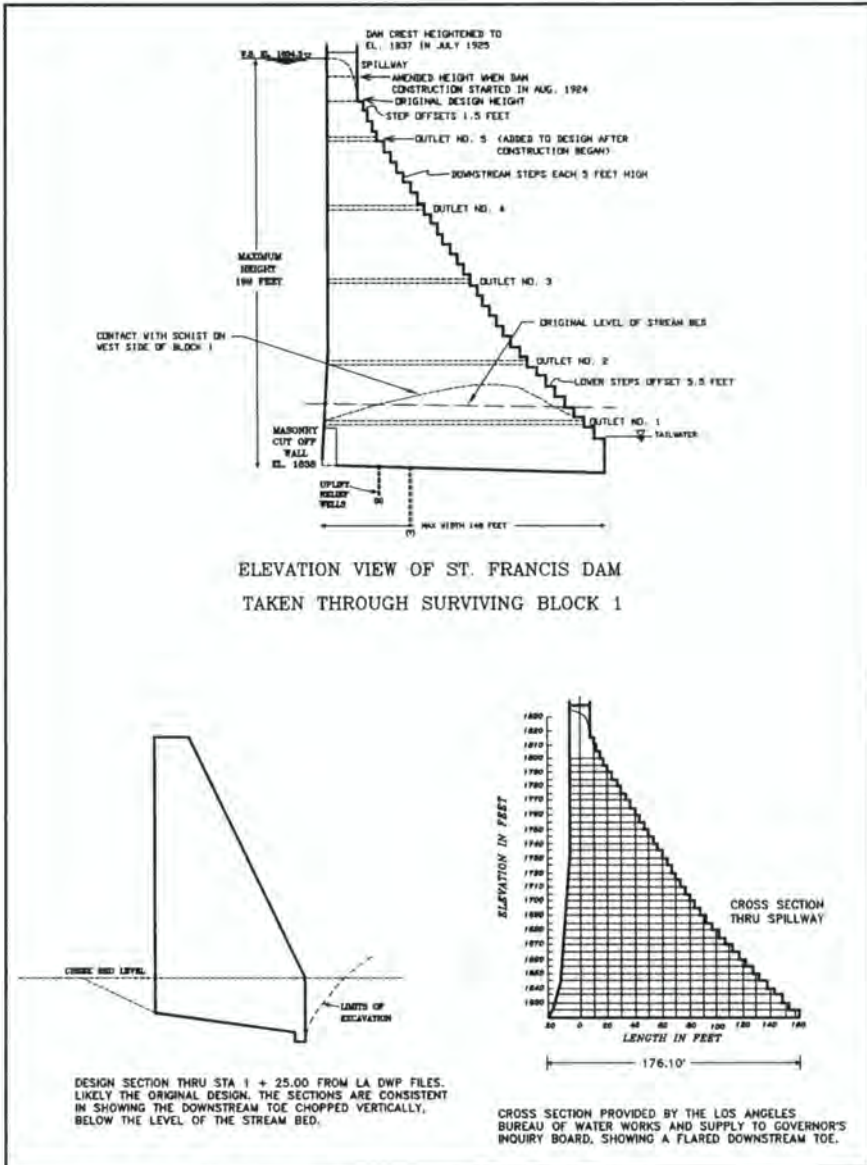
Cross sections of St. Francis Dam through the outlet works contained in Block 1, the only section of the main dam to survive the failure. The upper section is a reconstruction by the author. Some uplift protection, in the form of relief wells, had been provided for the central core of the dam, within the stream channel. No such protection was afforded to the sloping abutments. The section at lower left is from the design sections for the original dam, made in 1923. The section at lower right is that provided by the Bureau of Water Works to the Governor's Board of Inquiry following the failure. Note the variance in maximum base width between these representations. It is unlikely that the dam was as wide as portrayed to the public, although the variance may have been unintentional, given the rush with which the drawing at the lower right was produced.
